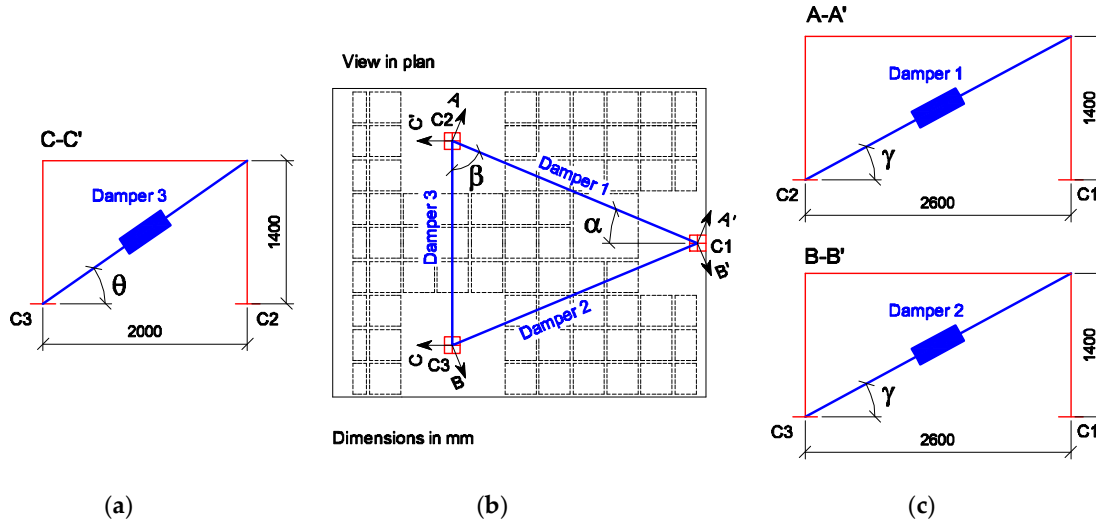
Layout of dampers at the first story: (a) elevation of the installation scheme of damper 3; (b) plan view; (c) elevation of the installation scheme of dampers 1 and 2.
